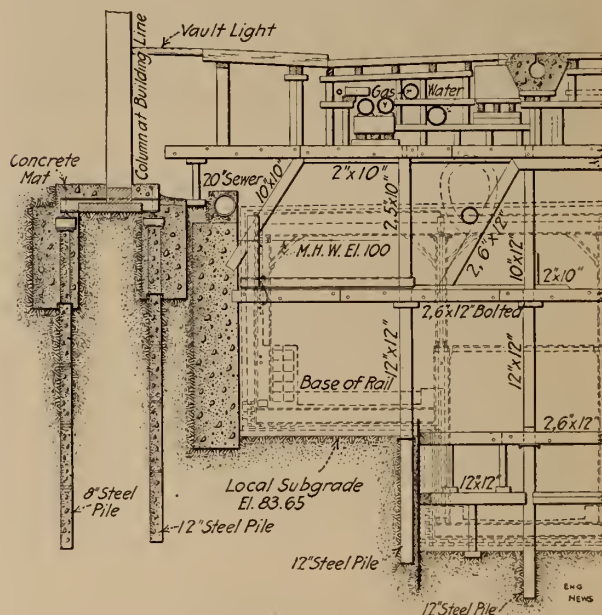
CONCRETE SIDEWALLS AND ARCHED TIMBER
